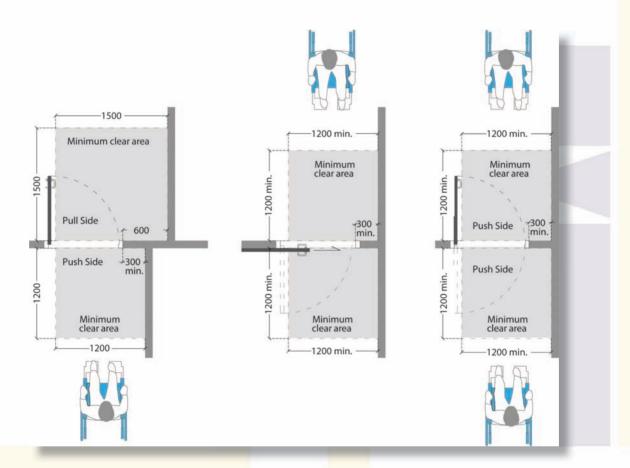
Maneuvering Space Needed for Wheelchair Users to Approach Doors
